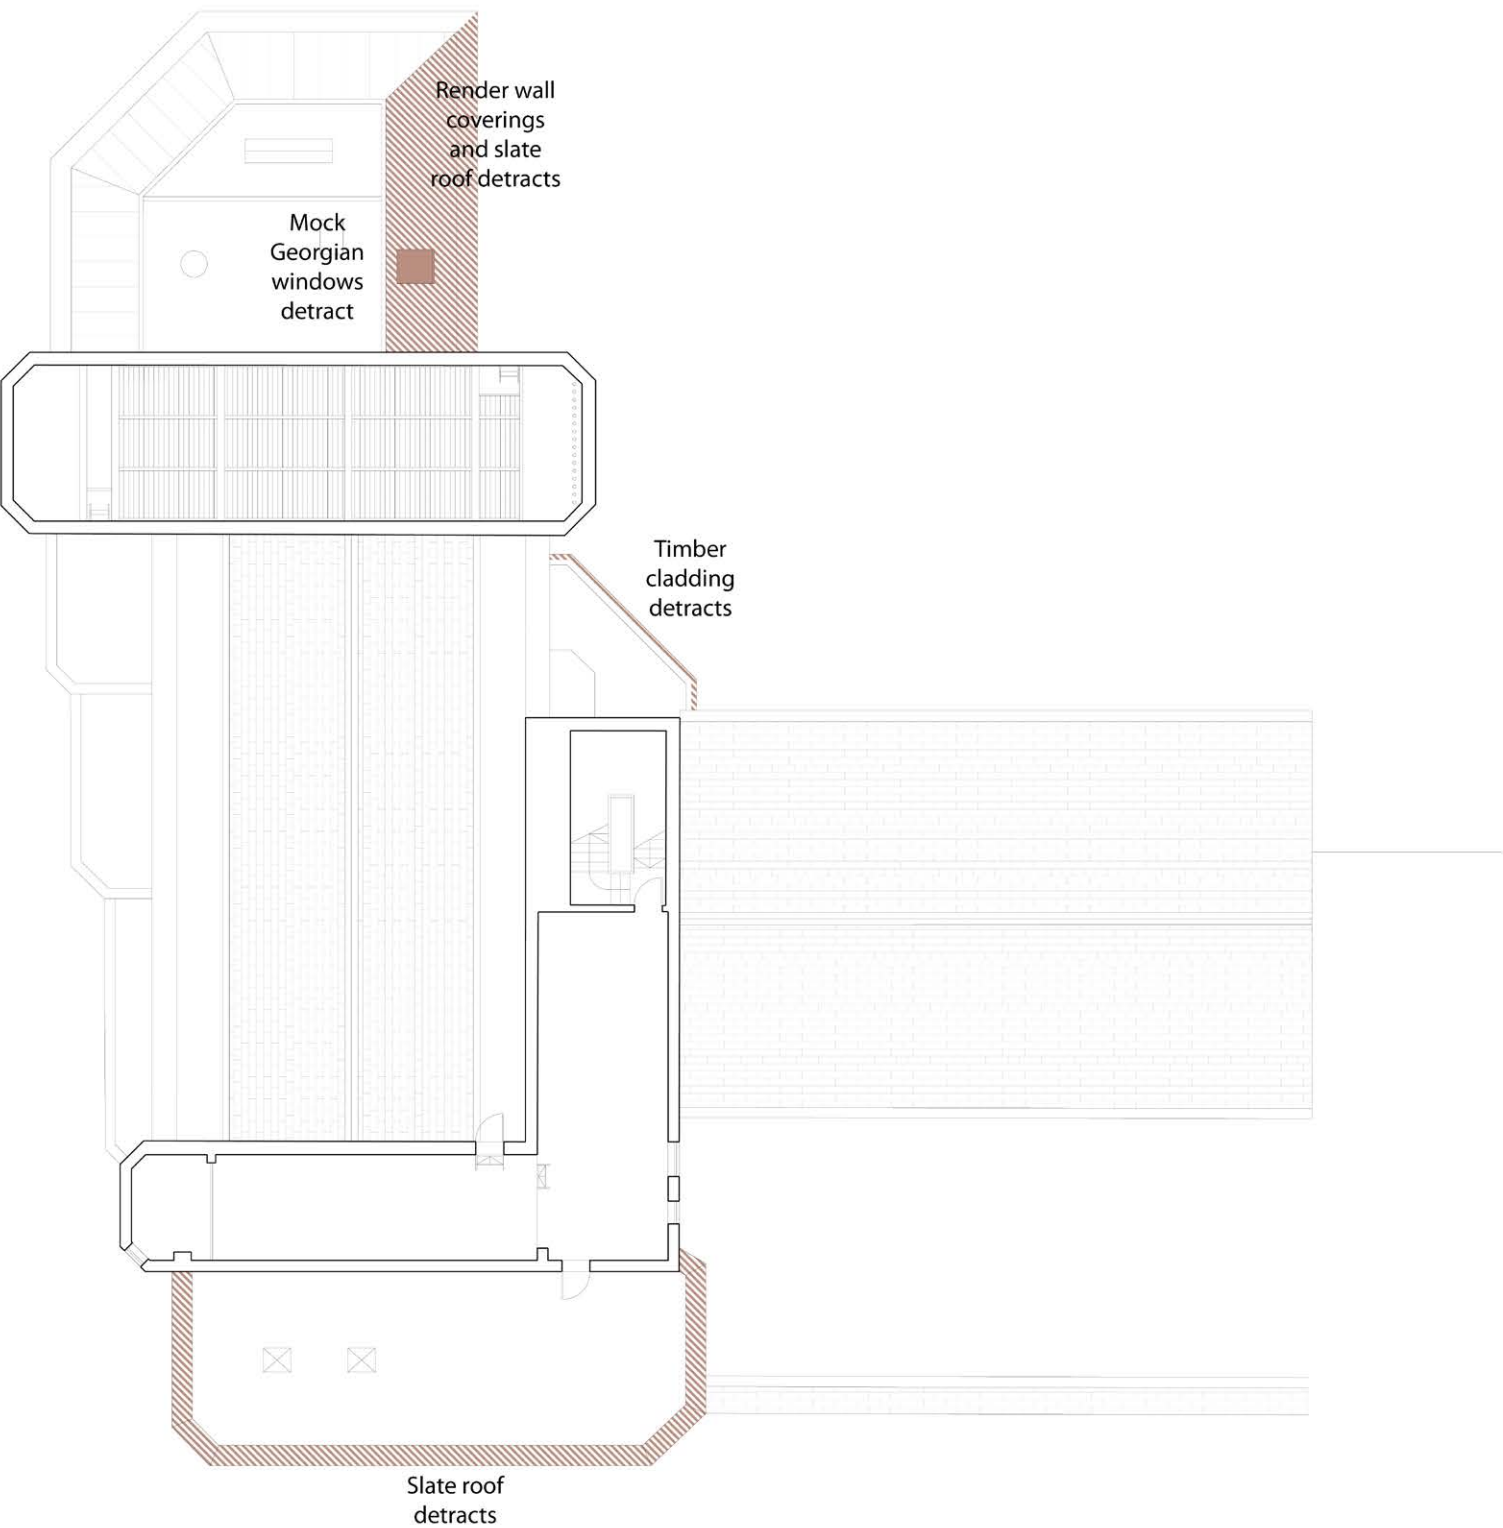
Third floor detracting fabric [Ian Chalk Architects]
